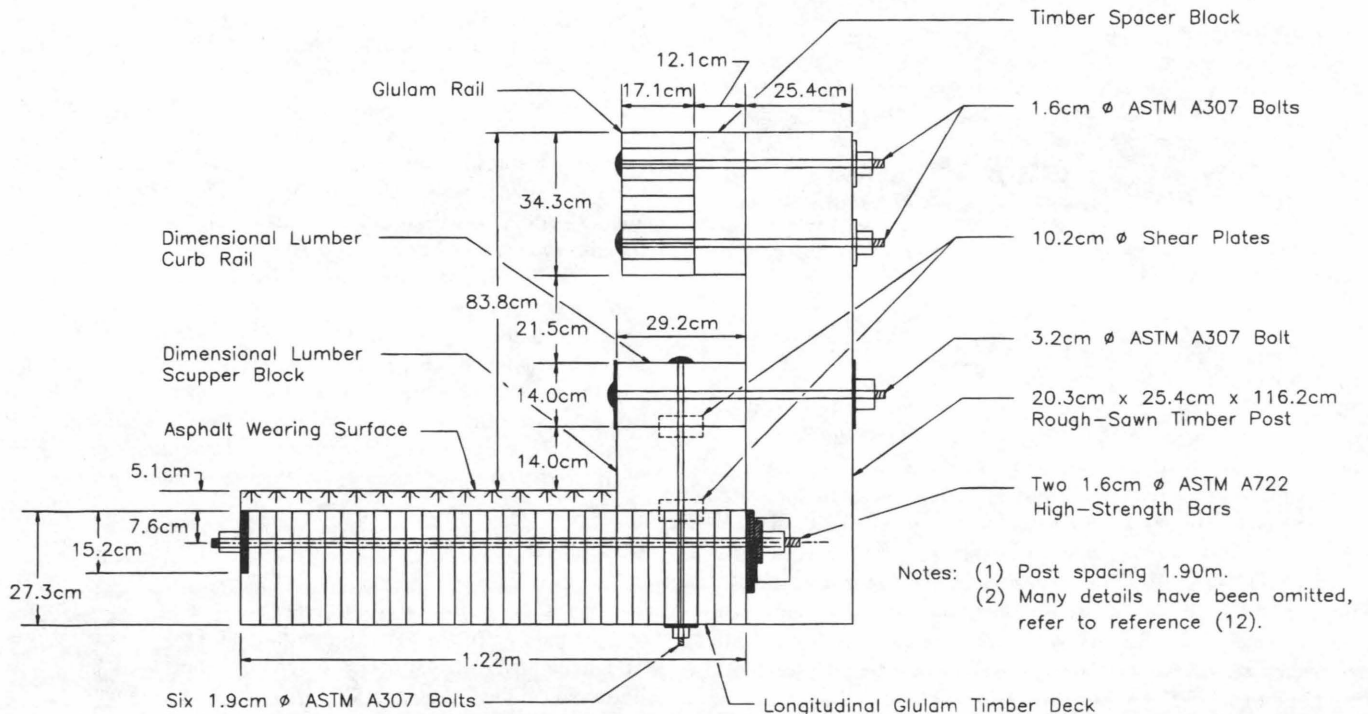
Glulam timber with curb bridge railing (GC-8000).
